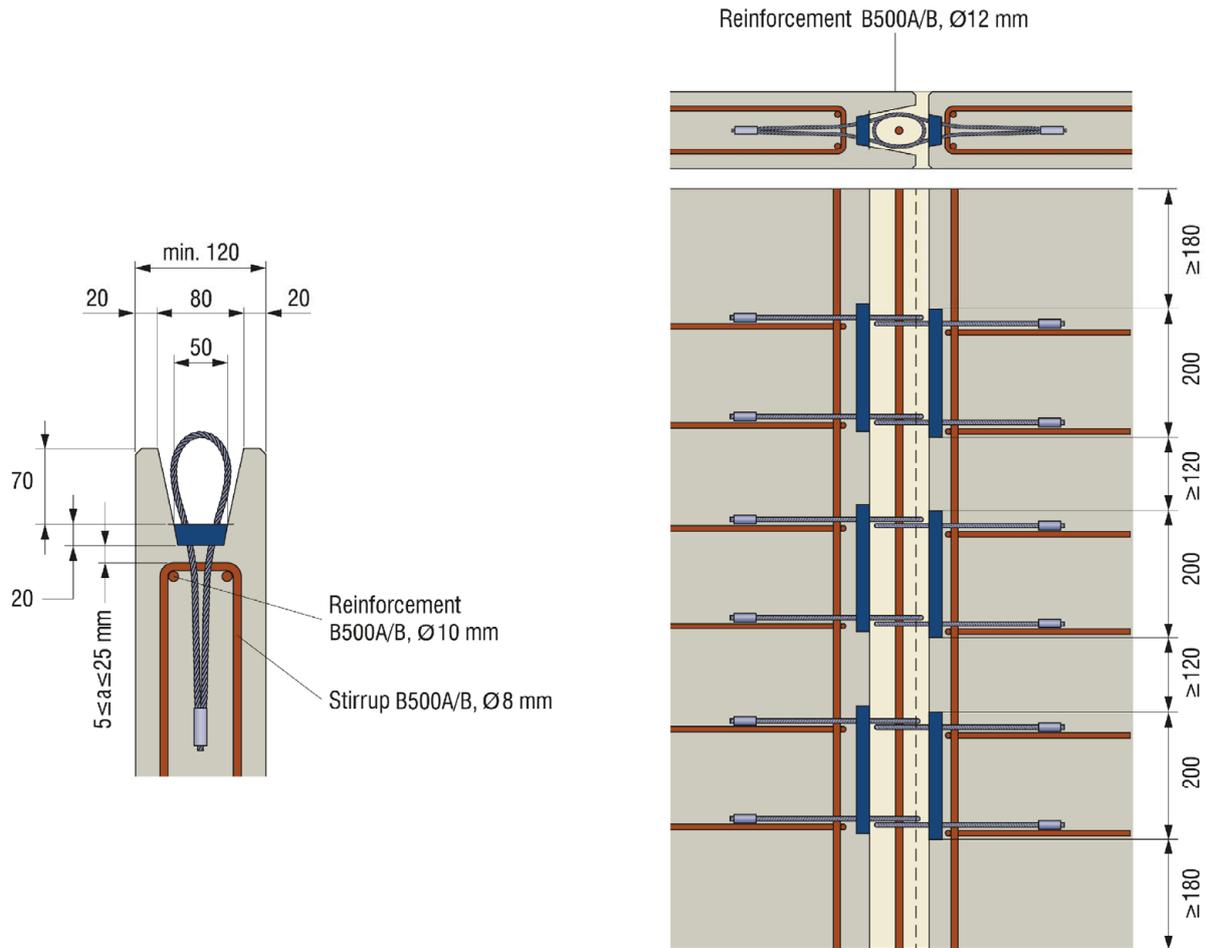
Geometry, reinforcement (Detail precast element A and B)
